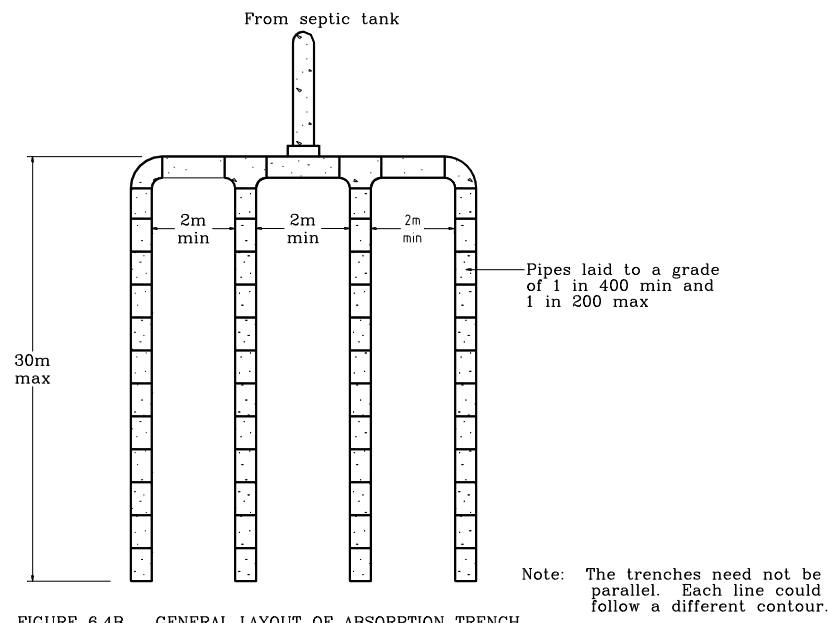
B GENERAL LAYOUT OF ABSORPTION TRENCH
